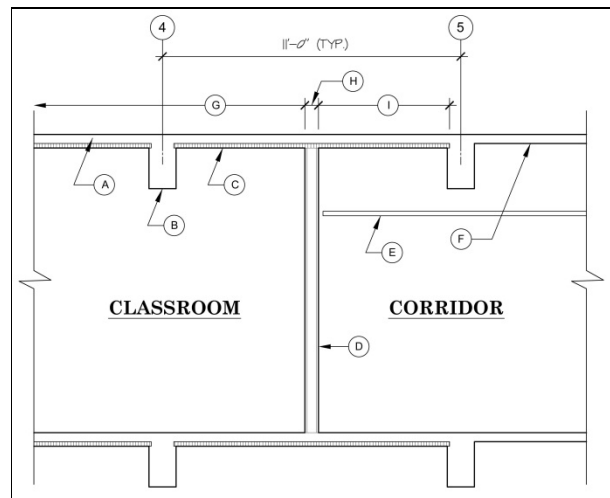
Section at partition between classroom and corridor. A = concrete roof / floor slab; B = concrete beam; C = Tectum form plank; D = steel stud / plaster partition; E = suspended ceiling; F = bare concrete roof / floor slab (no form plank); G = exposed form plank removed in 2011; H = remaining form plank to be removed at top of partition; I = remaining form plank to be removed above suspended ceiling.
